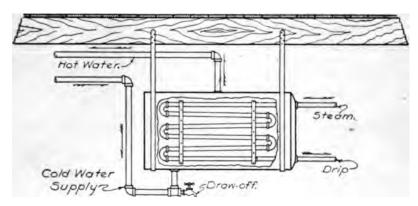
Domestic Hot Water Supply—Steam Coil in Boiler.
